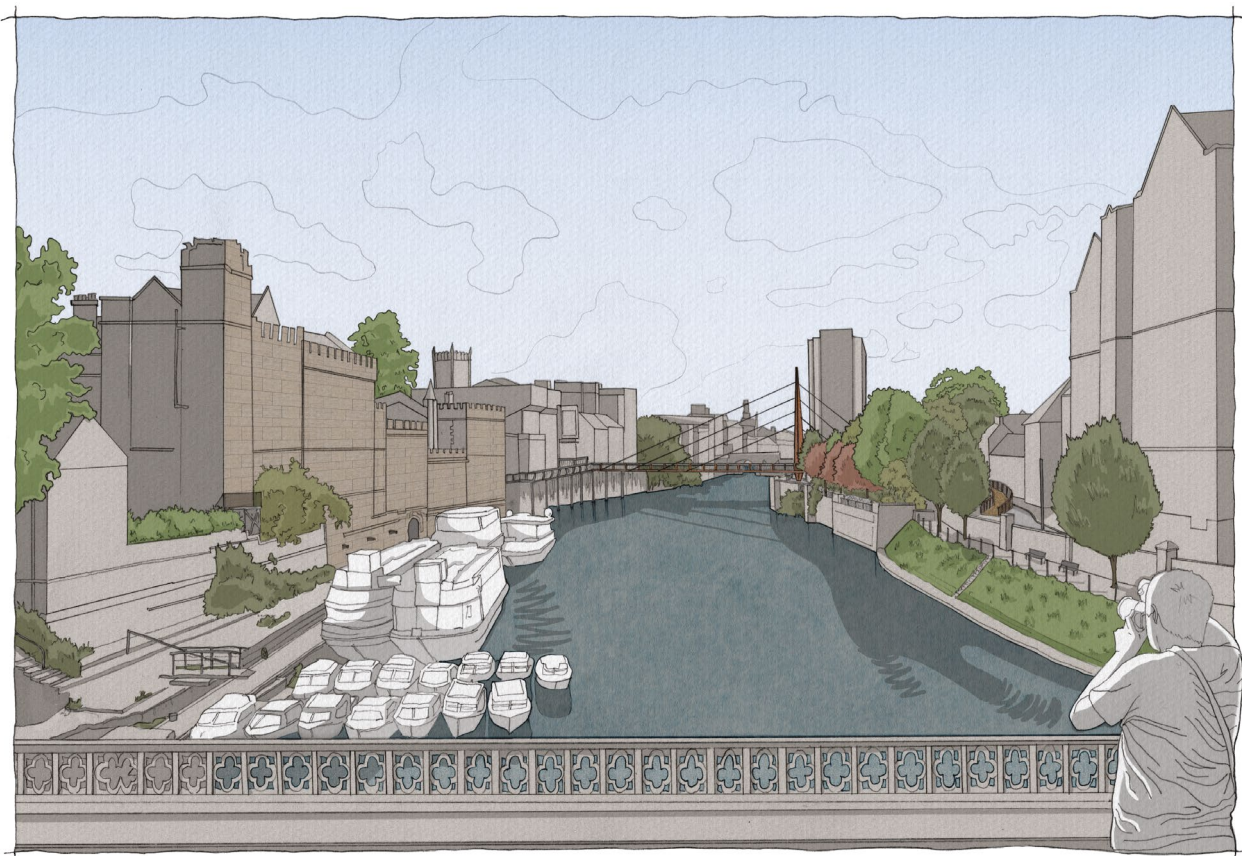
F - Illustrative View from Lendal Bridge of a potential pedestrian and cycle bridge linking Coney Street and North Street Gardens. Credit: BDP (www.bdp.com)
